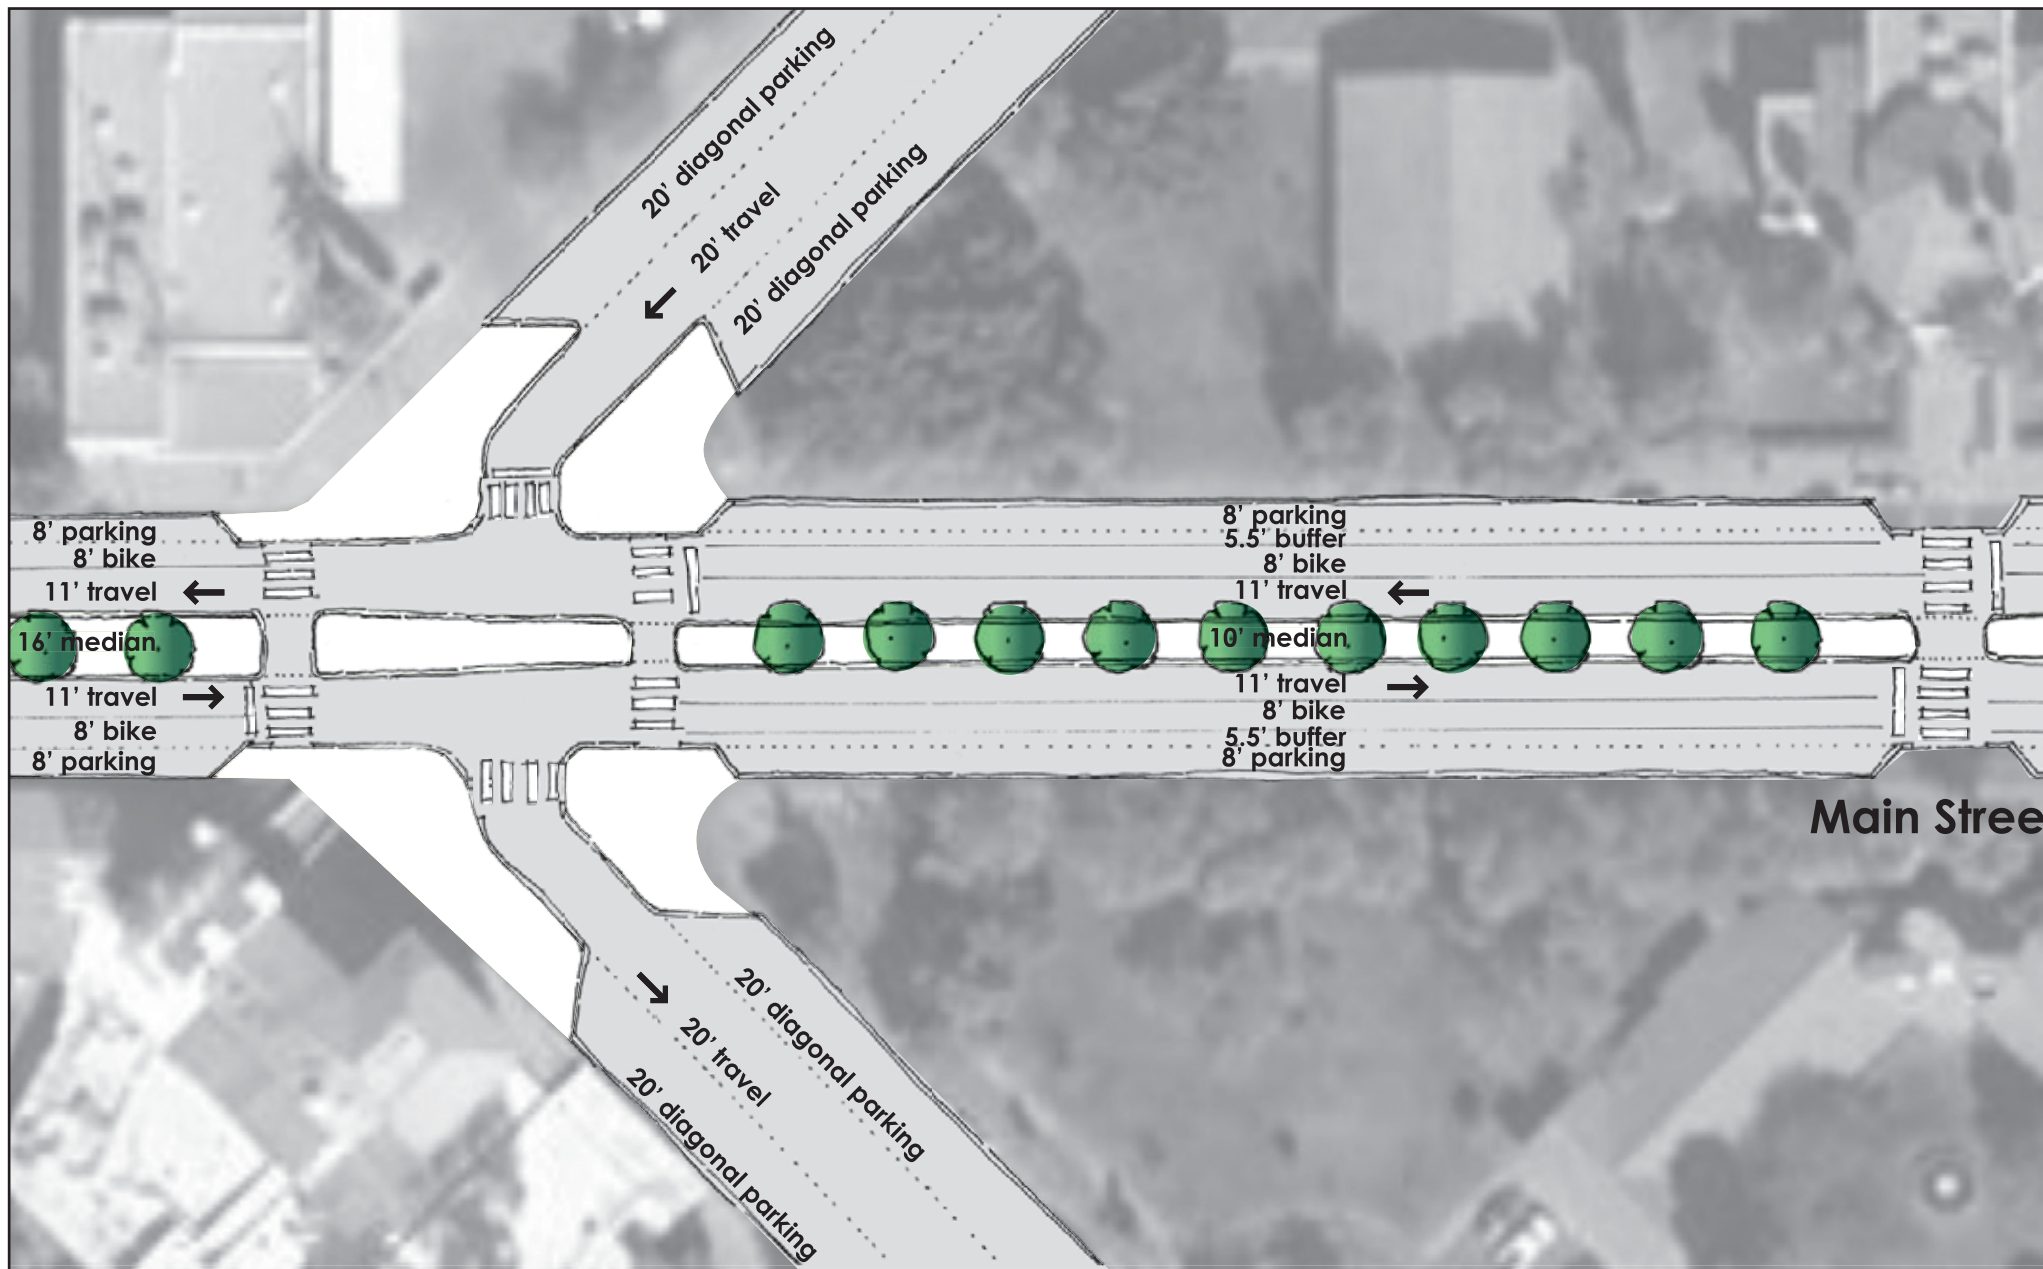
Short-term recommendations for Main Street through Plaza Park.
